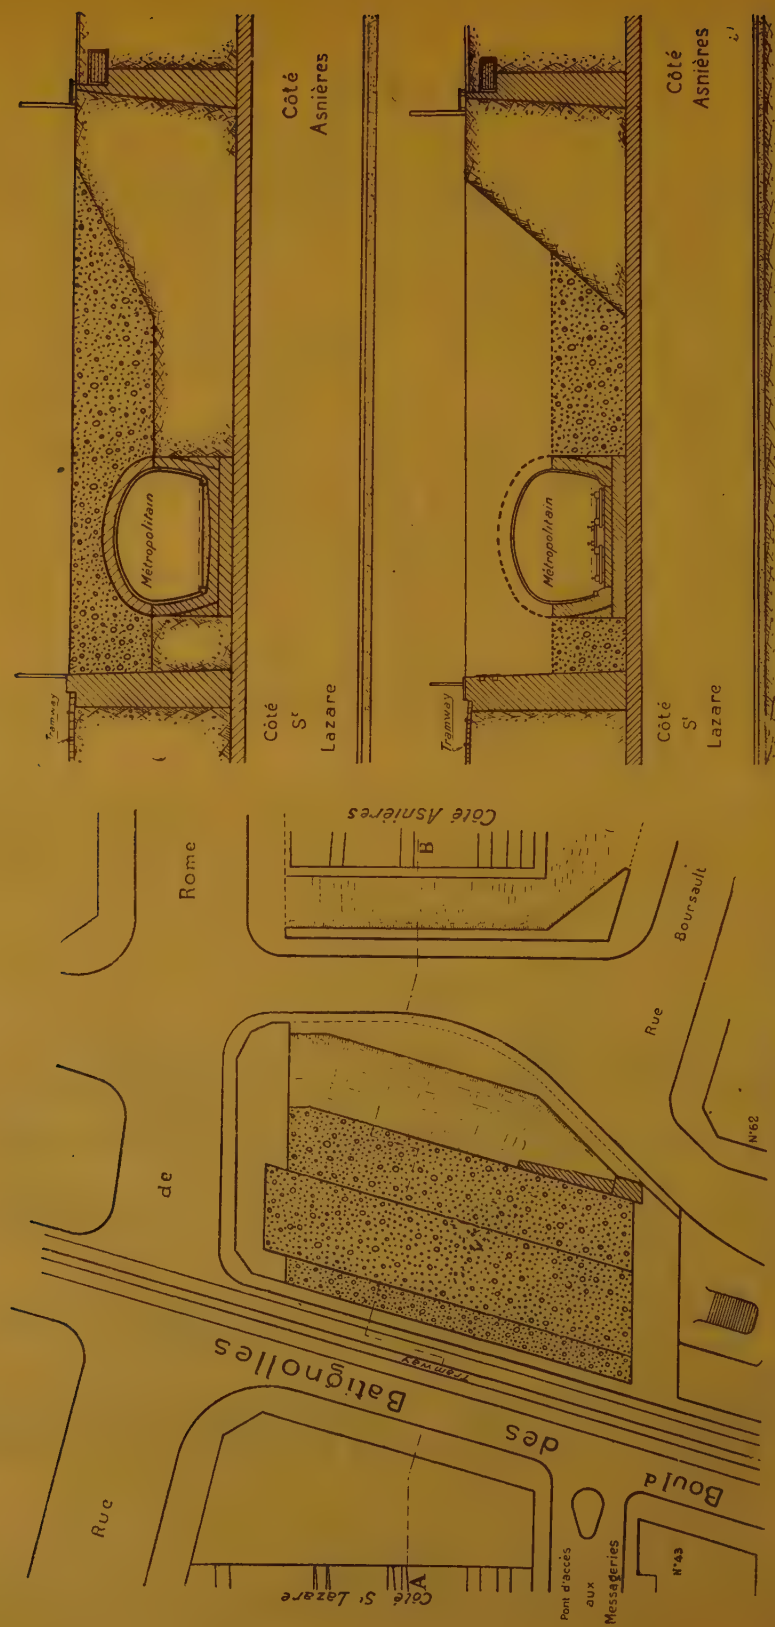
Construction of Batignolles bridge. — Demolition of Metro tunnel. — Excavations for the Metro bridge.
